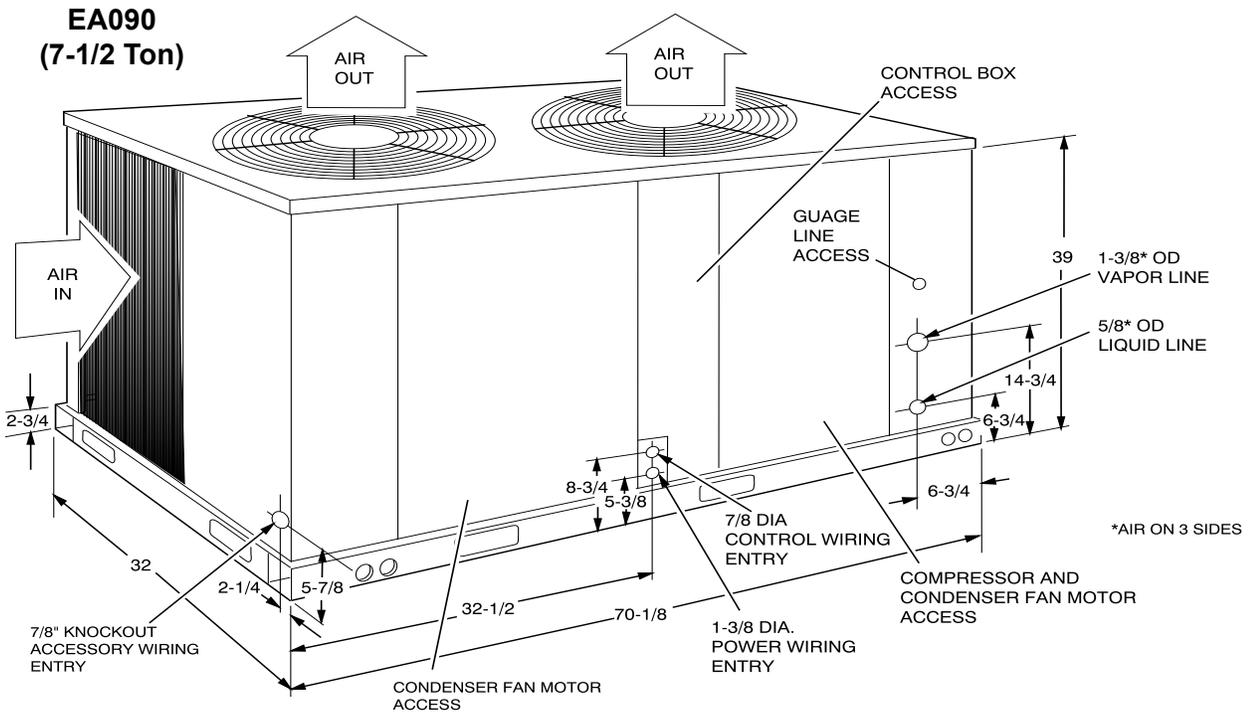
UNIT DIMENSIONS & CLEARANCES - OUTDOOR UNITS
